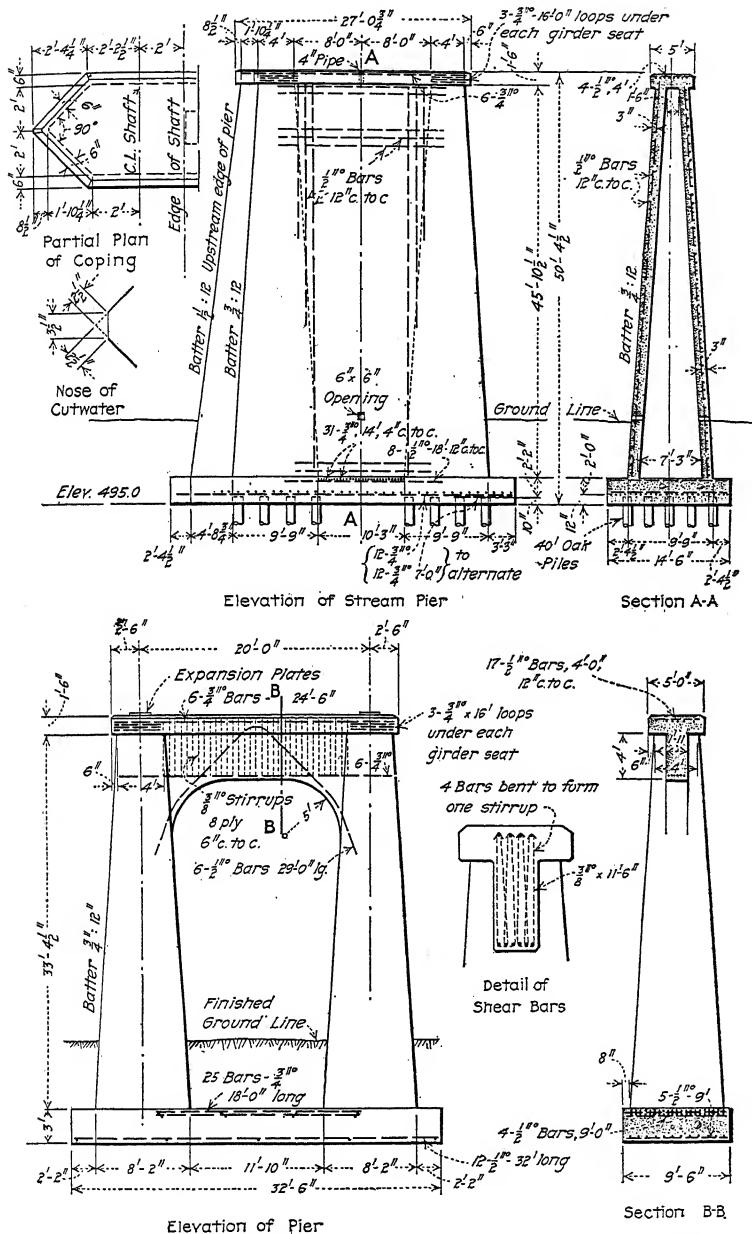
Details of typical piers, North Samuels Avenue viaduct,
